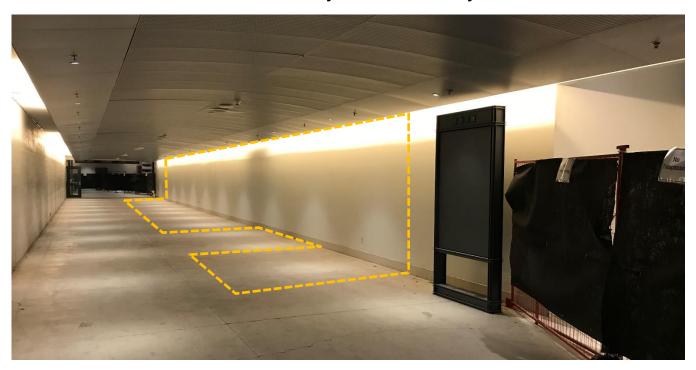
Approximate area of intervention in Bay Concourse Hall (Proposed locations of 'Stair M' and 'Elevator 3')
